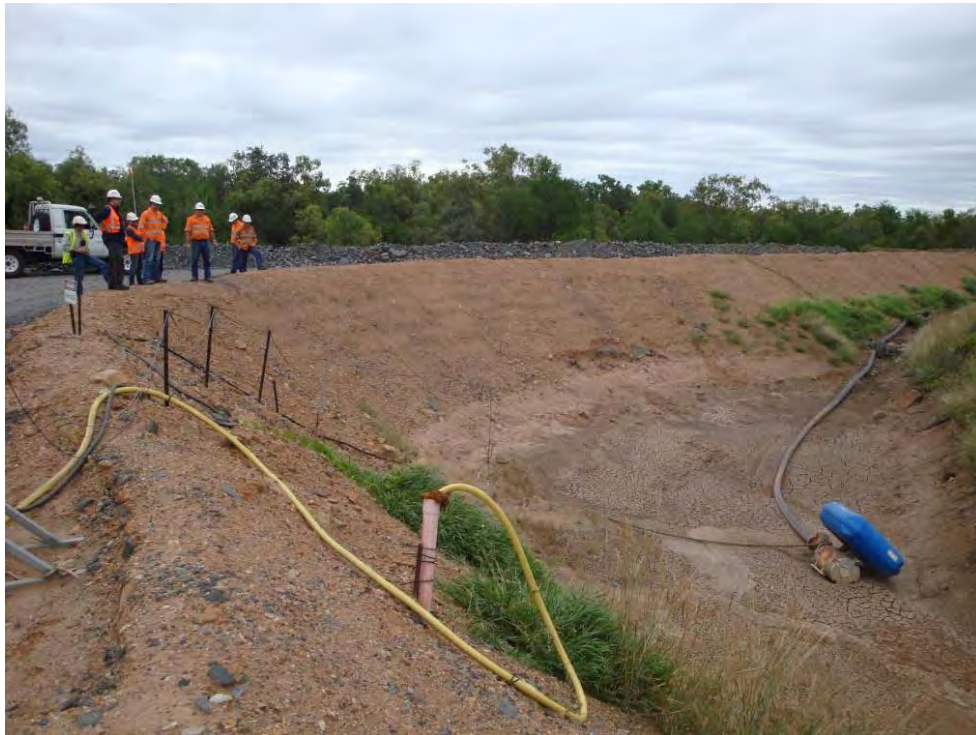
Reconstructed sump at the west outer corner of the ROM Pad.
